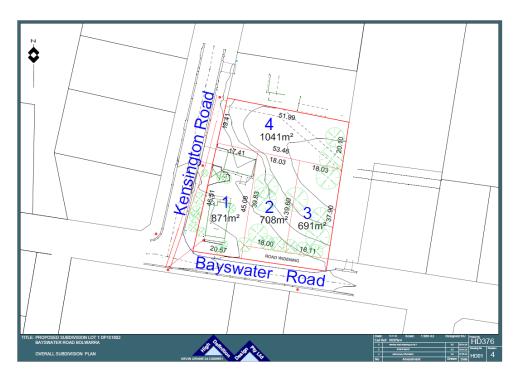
Plan of subdivision (High Definition Design Pty Ltd)
